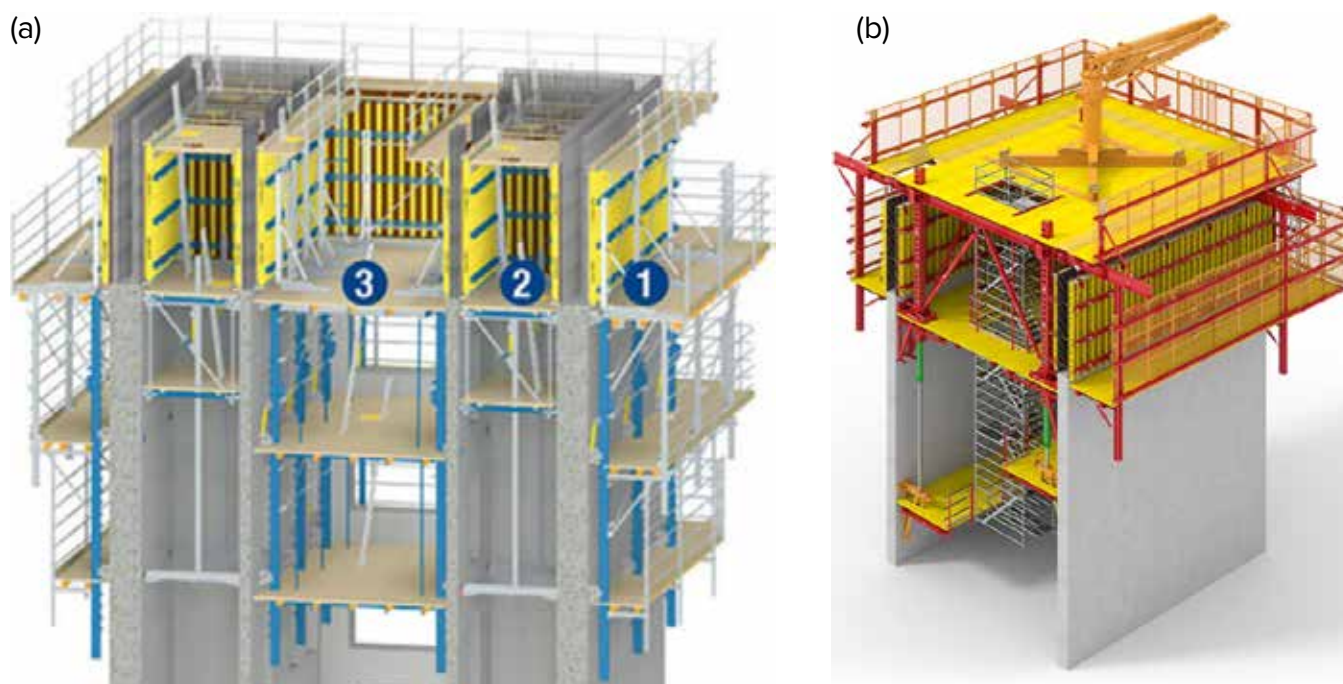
Schematics of self-climbing wall formwork systems. Hydraulic jacks used to lift the formwork are connected to anchors in recently placed concrete below. These anchors may necessitate requests for modifications to reinforcing bar layout: (a) the numbers on this system indicate a lifting sequence to accommodate the installation of reinforcement; and (b) this system is capable of lifting inner and outer forms and work platforms simultaneously. (Images courtesy of Doka and PERI.)
